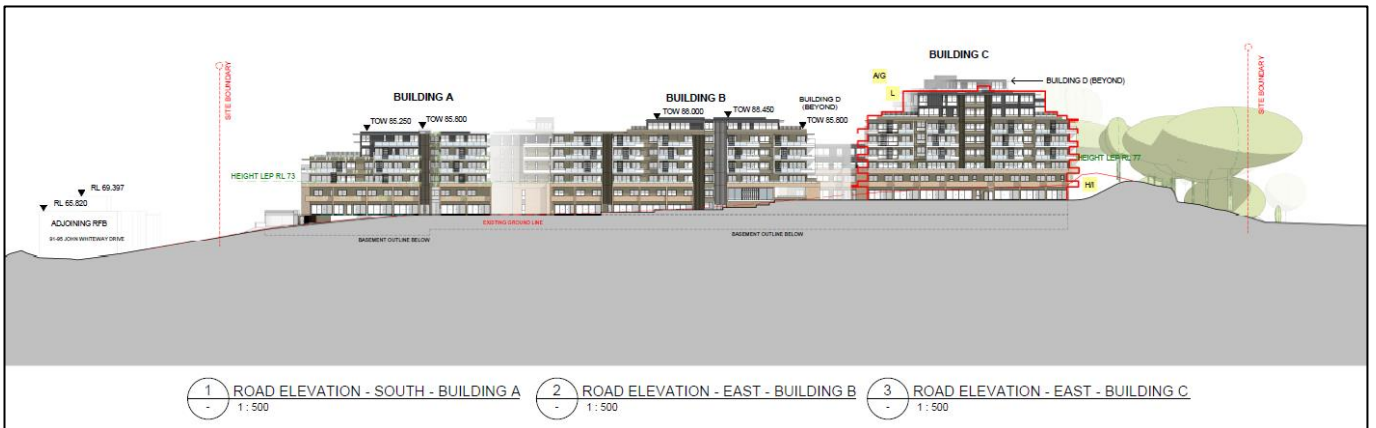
Approved Road Elevations (Source: Marchese Partners DA003.1; 18/02/2022)
